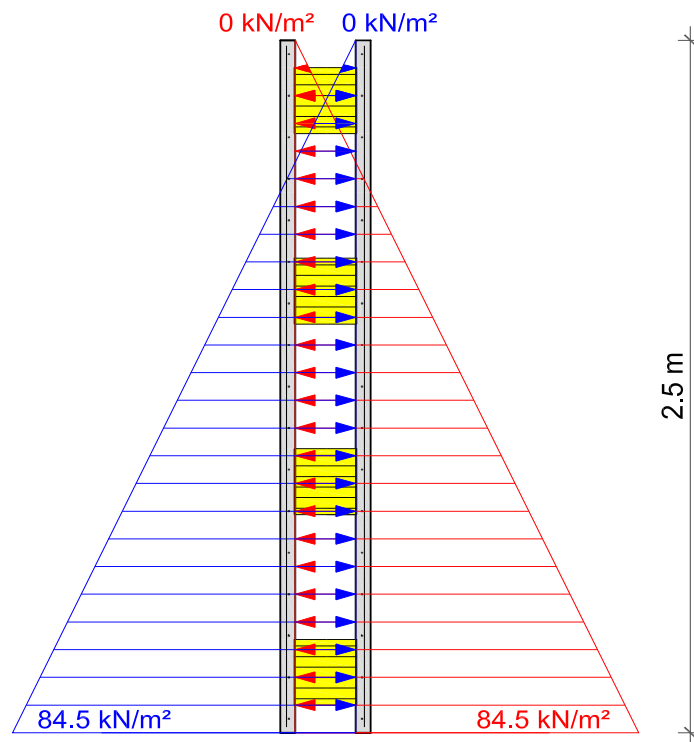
Concrete pressure on one double wall element when the whole height is concreted at once
